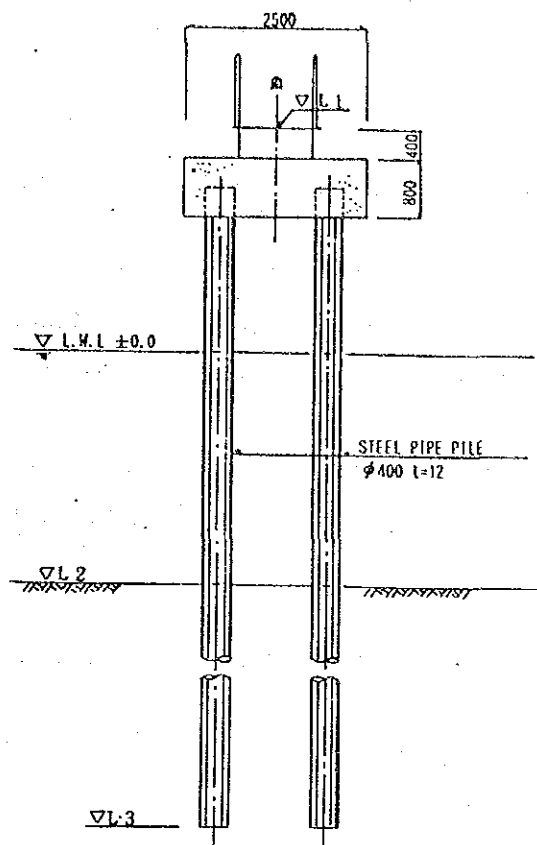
Layout of Mooring Facilities of Muntok Ferry Terminal
